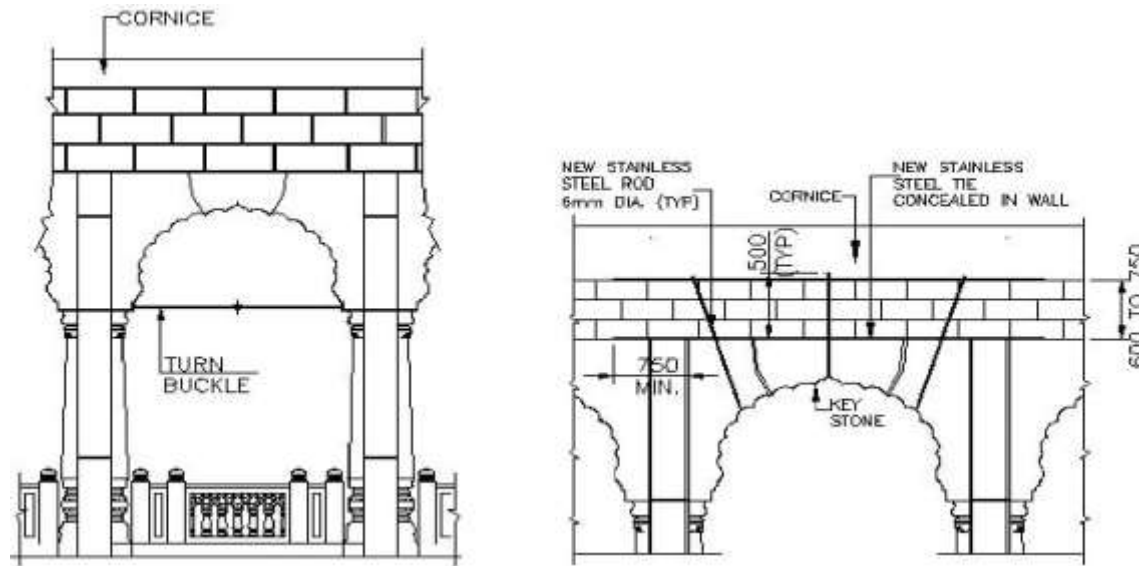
Detail of interventions in arches : (A) strengthening of Arches using Ties, and (B) strengthening ogee arches by pinning and Reinforcement band.
